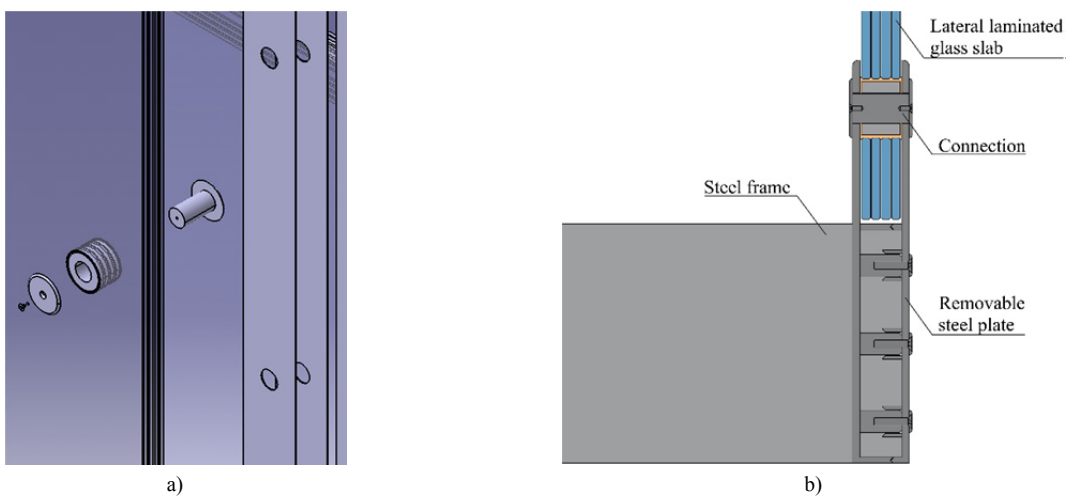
Exploded view of the vertical glass slab-to-steel frame connection, b) detail of the connection
